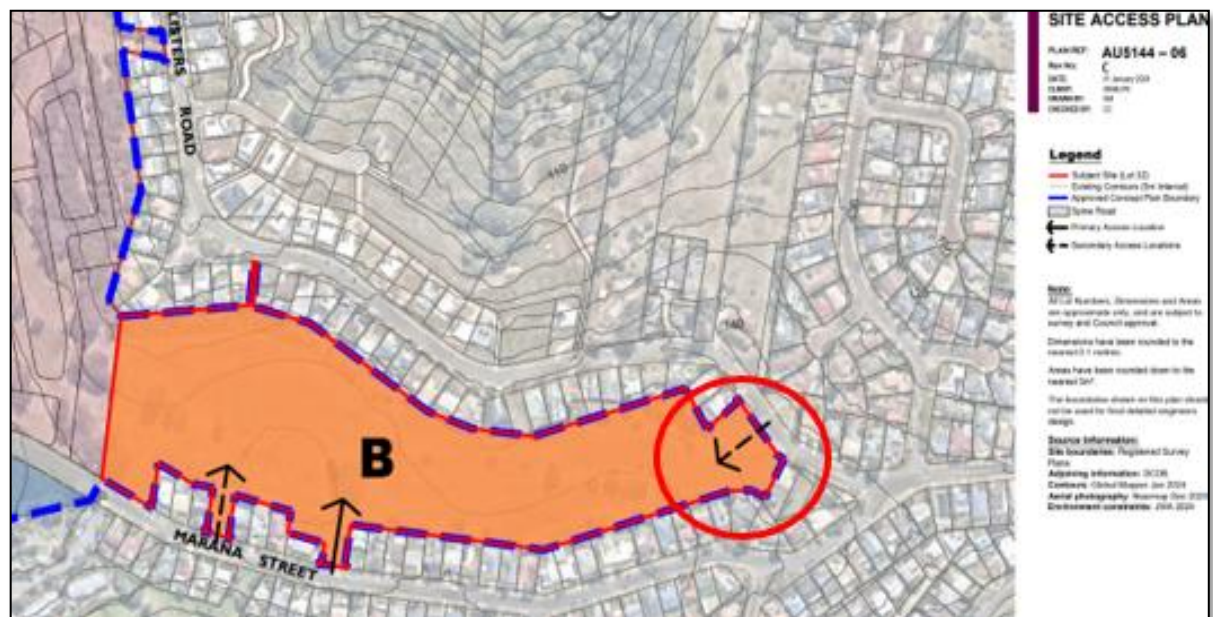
Extract of submitted Site Access Plan prepared by the applicant - red circle highlighting proposed additional option for access
